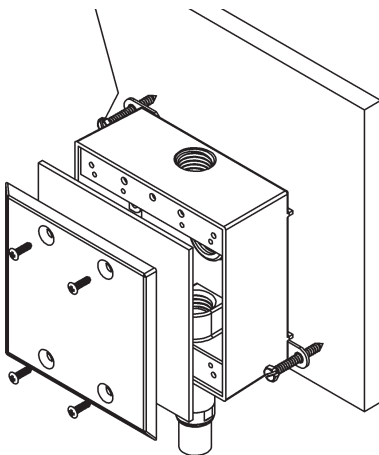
Outside Air Unit with Doublegang Weatherproof (WP) Enclosure
